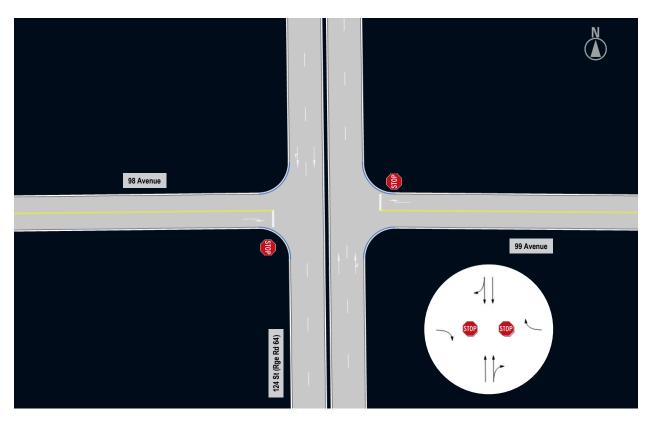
Proposed 124 Street/Range Road 64 and 98/99 Avenue Intersection Upgrades
